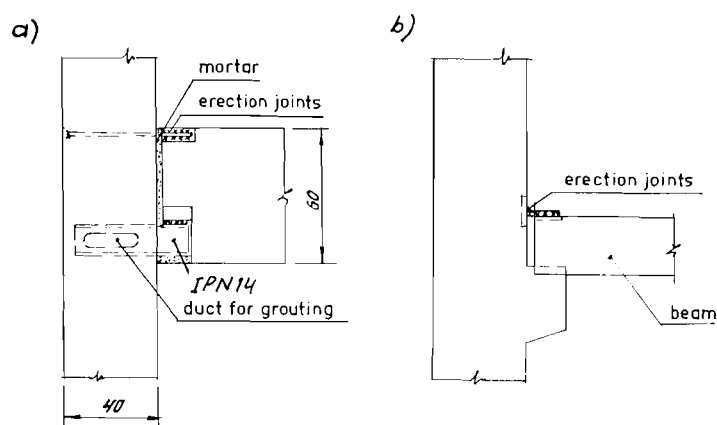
Beam and column joints in multi-storey buildings. (a) A joint with a concreted I-beam and rods projecting from the column and welded to the insertion parts of the beam; (b) joints made with angle brackets concealed in the longitudinal walls.
